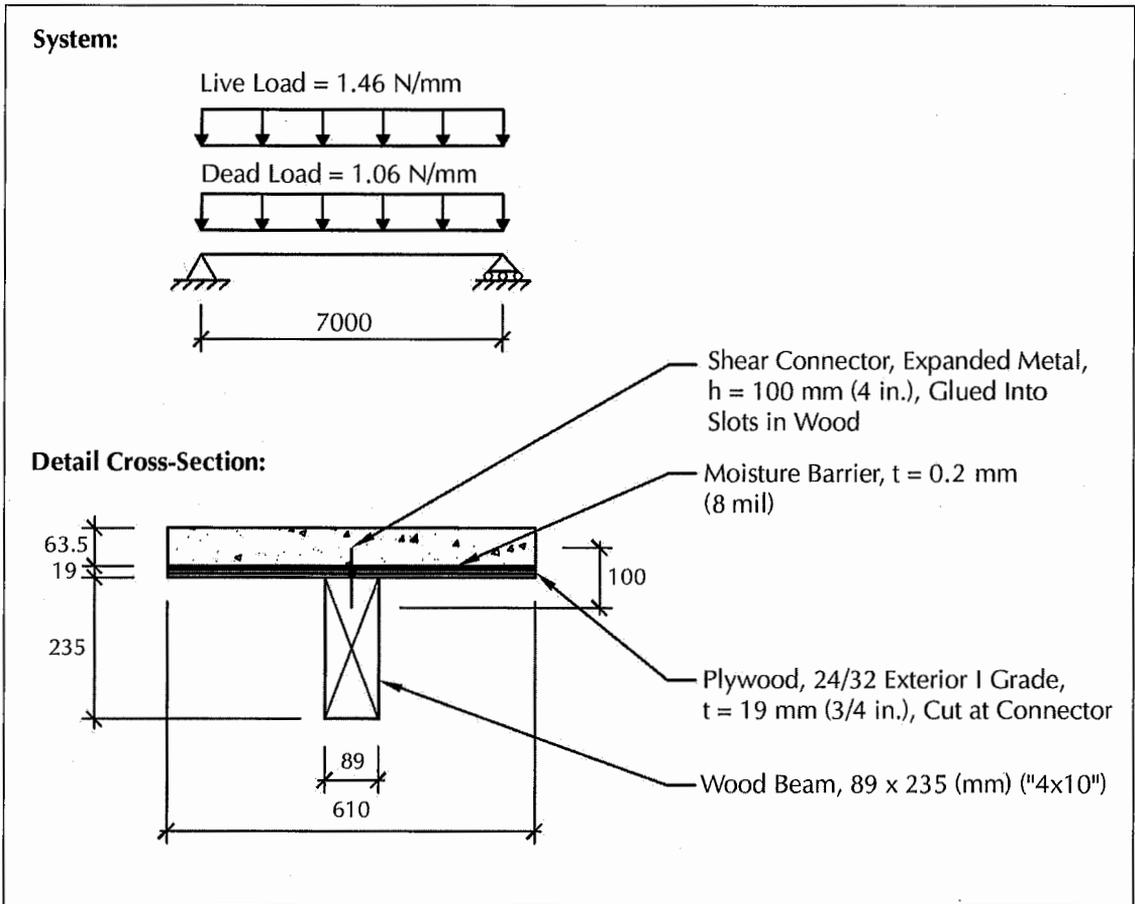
An example application of a commercial wood-concrete floor (all dimensions are in millimeters).
